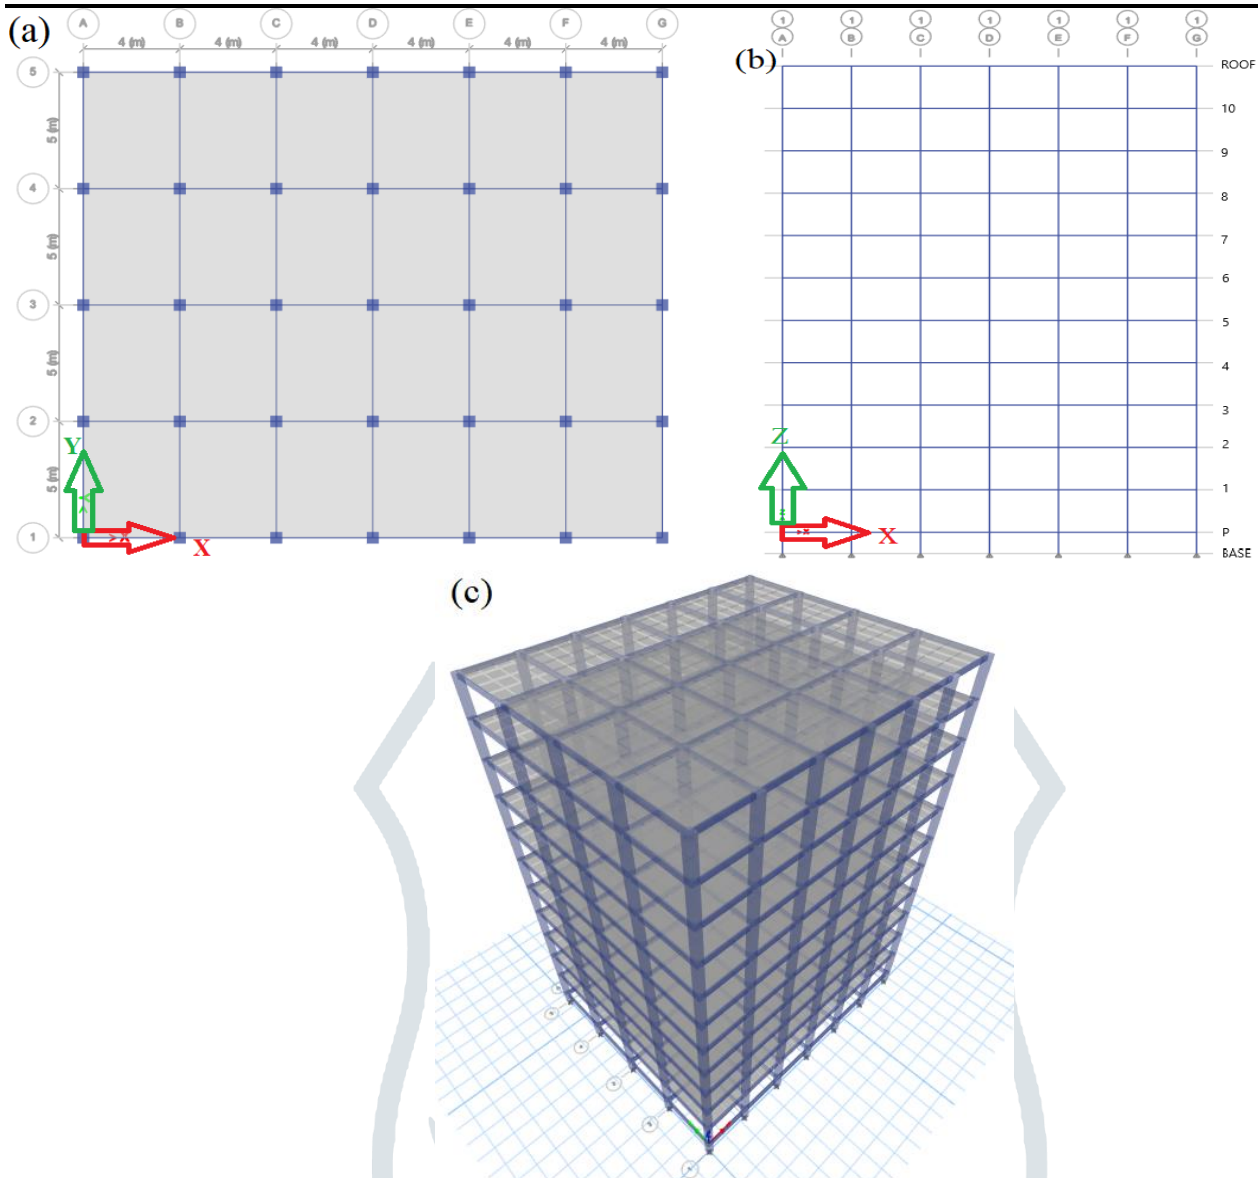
(a) Plan view (b) Elevation (c) 3D view of G+10 storey building
